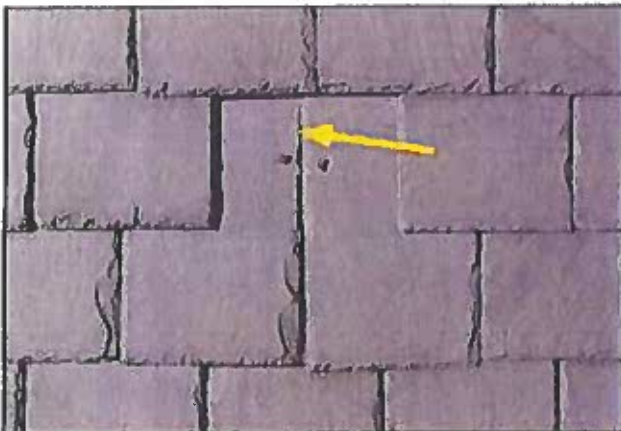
Slate defects - missing slate leaves joint between slates of the lower course exposed to the weather (Arrow) and potential leak. Replace missing slate.
